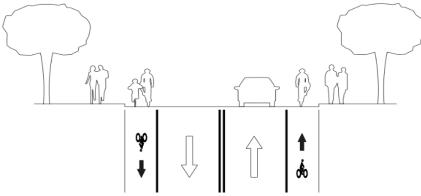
East Annie Street and Woodland Avenue Proposed Cross Sections with Parking Restrictions on Both Sides of the Street
